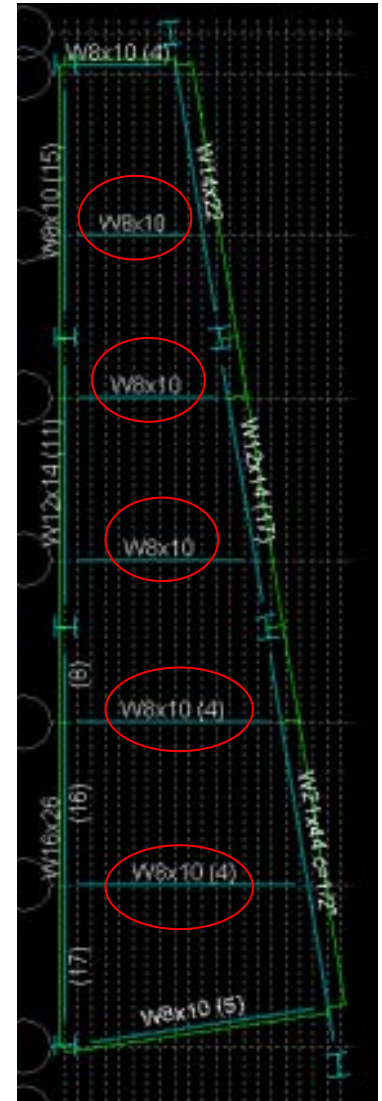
Plan View of 8x10 Beams Designed in RAM Structures
